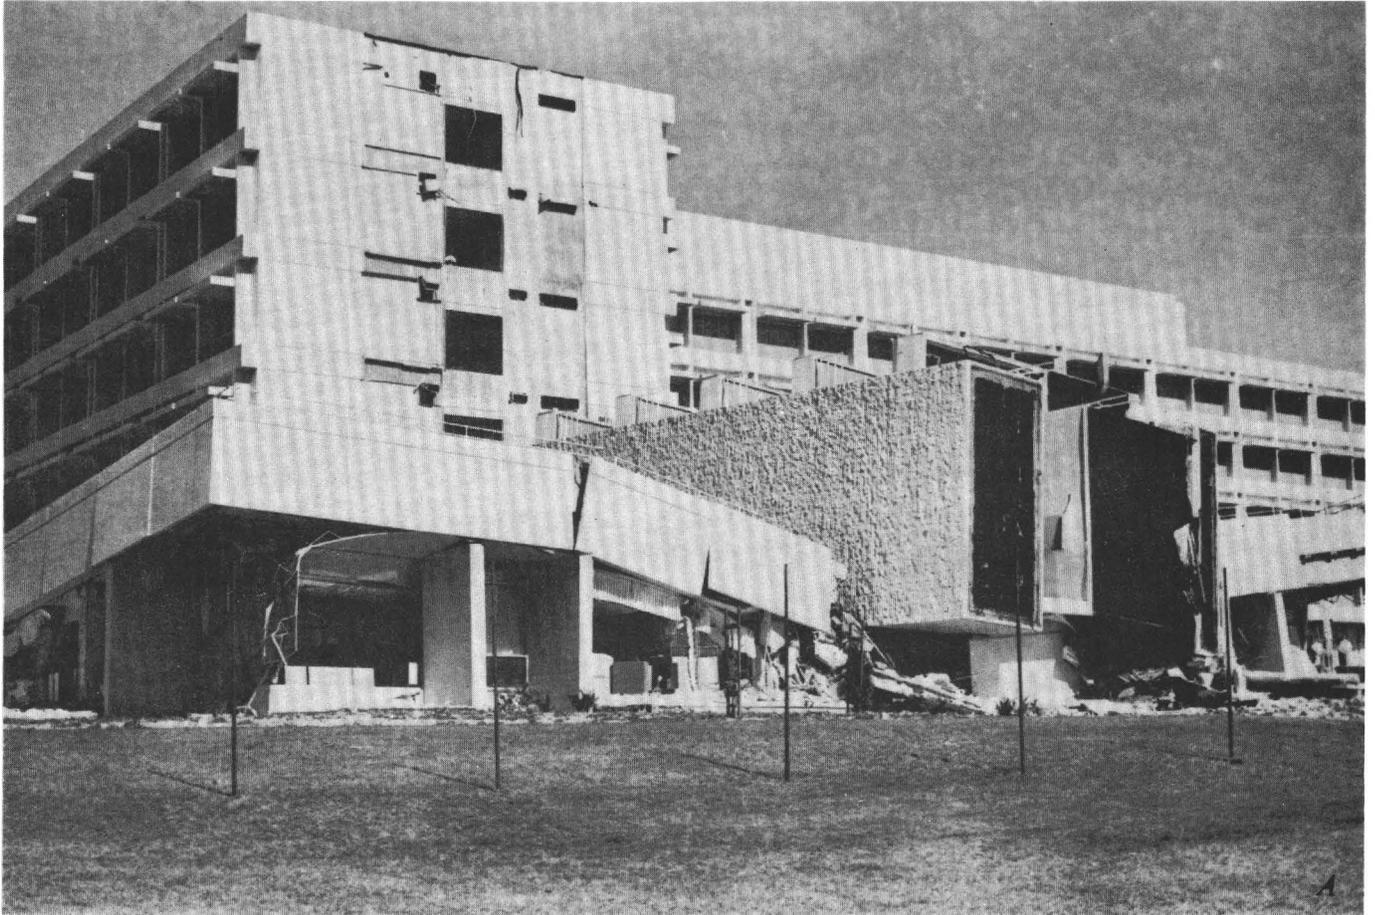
Damage to hospitals caused by the San Fernando earthquake. A, Southwest corner of Medical Treatment Building of Olive View Hospital, completed in 1970. South stair tower overturned and collapsed on one-story portion, roof at stair tower is center right (Steinbrugge and others, 1971, p. 45).
